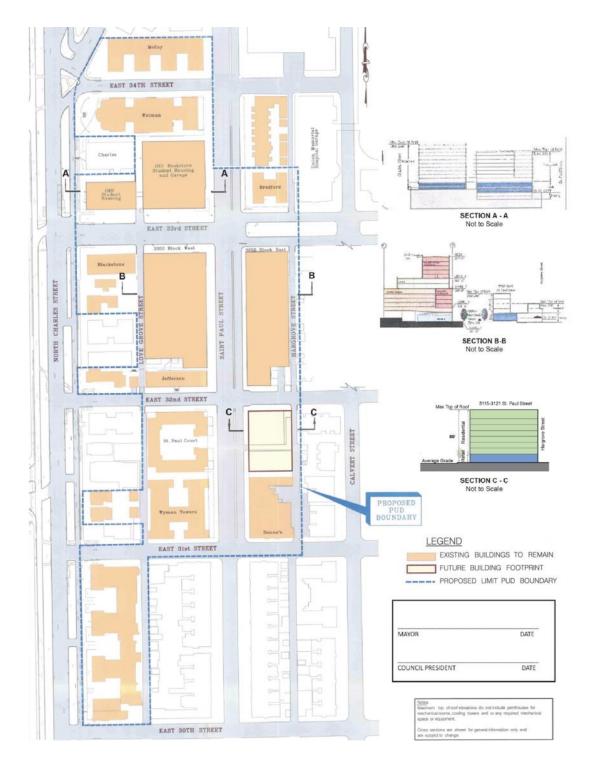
Clip of the North Charles Village PUD Sheet 3 of 4, "Preliminary Built-out Plan", proposed revision, December 2023. Note the section C - C has been added, the height changed from 90' to 80' and the PUD boundary remains the same as in the currently approved Sheet 3 of 4, "Preliminary Built-out Plan" dated October 2007.
